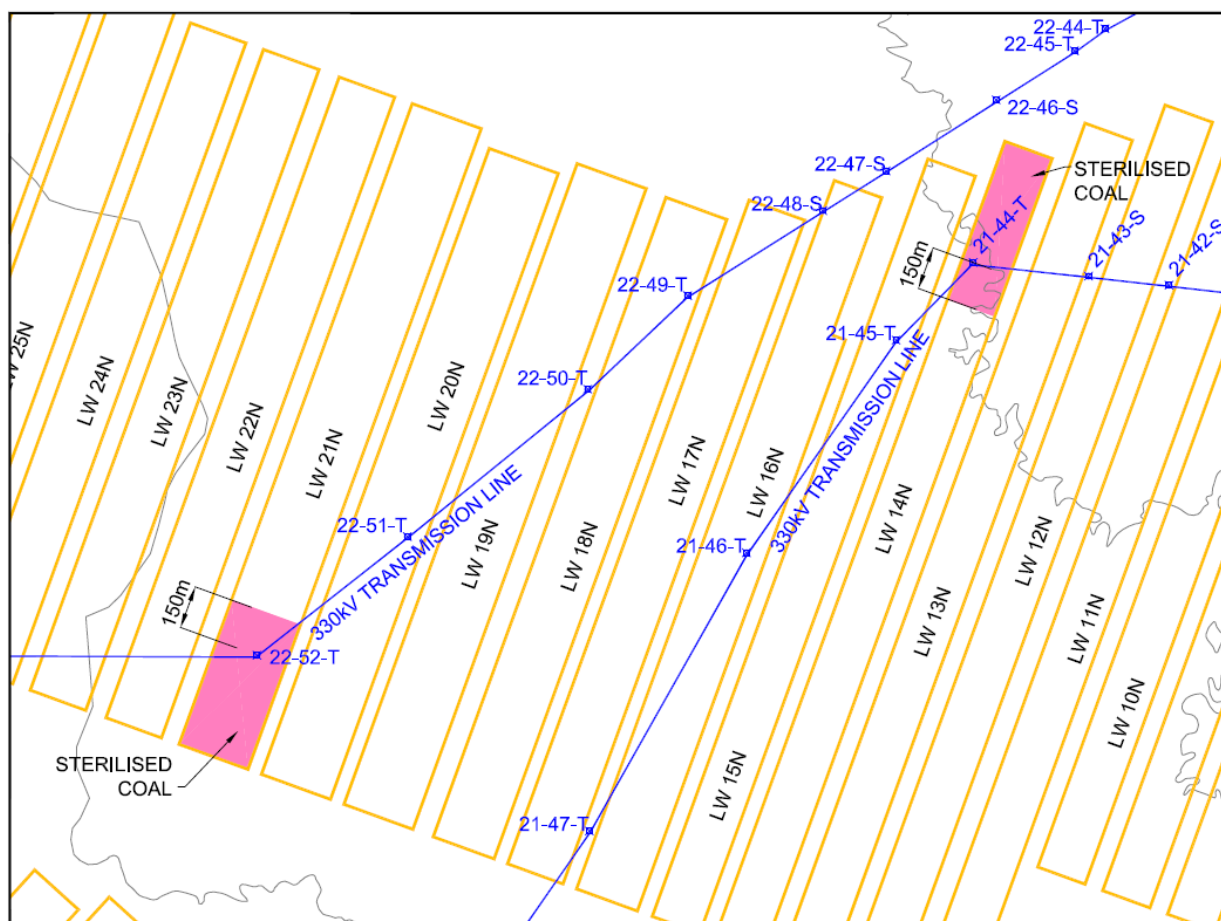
Plan showing potential coal sterilisation if no preventative works are undertaken at the two high angled tension towers labelled Tower 21-44-T and Tower 22-52-T
